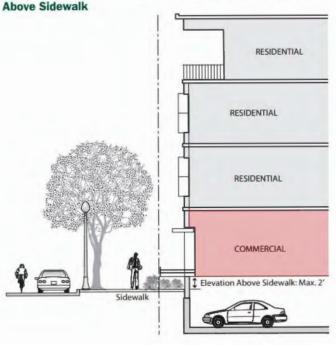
Residential Mixed Use: Commercial Elevation
